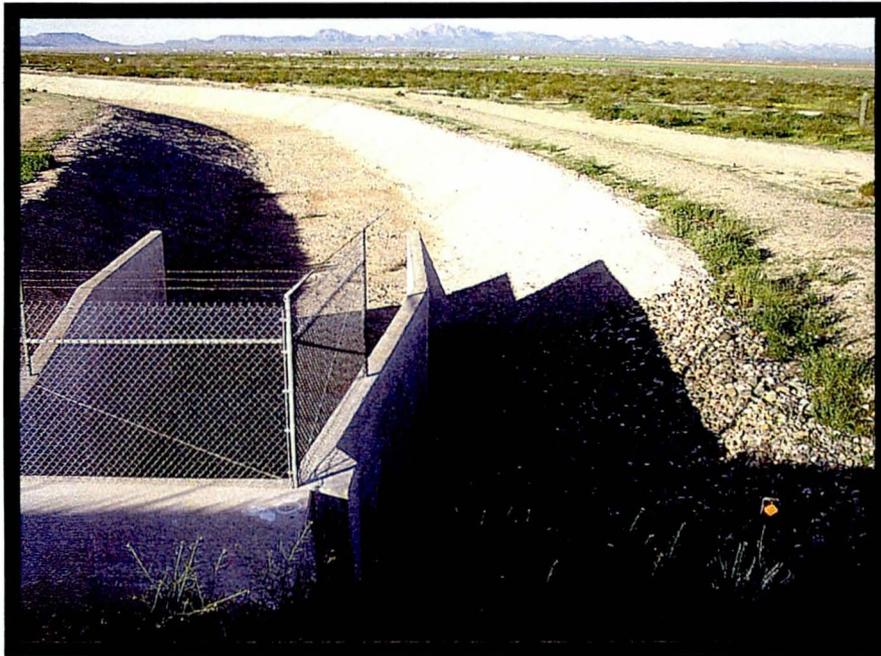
Principal Outlet Floodway: Saddleback diversion channel.
